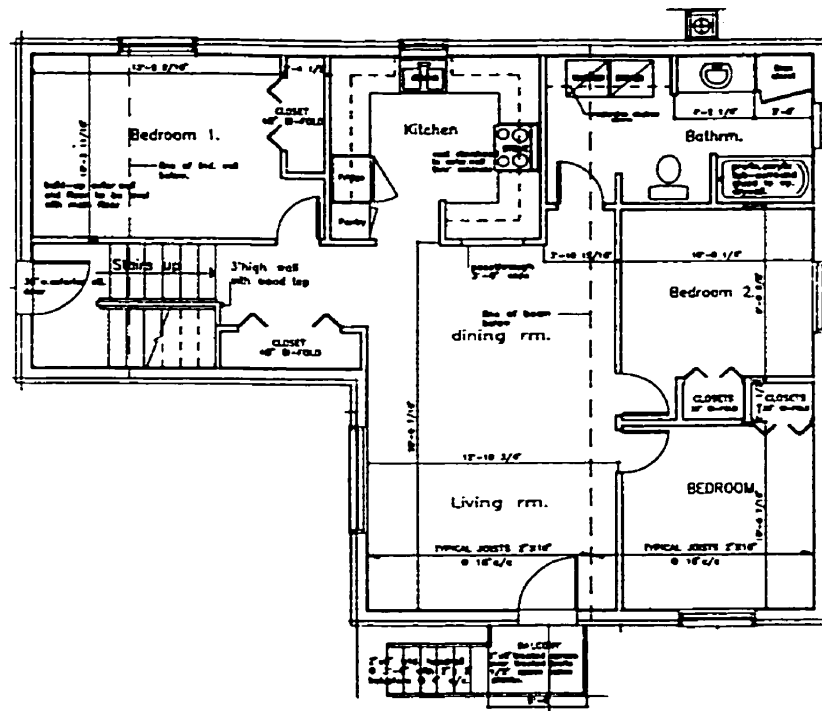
Ground floor (Cedar Model, renovation, 1996)
